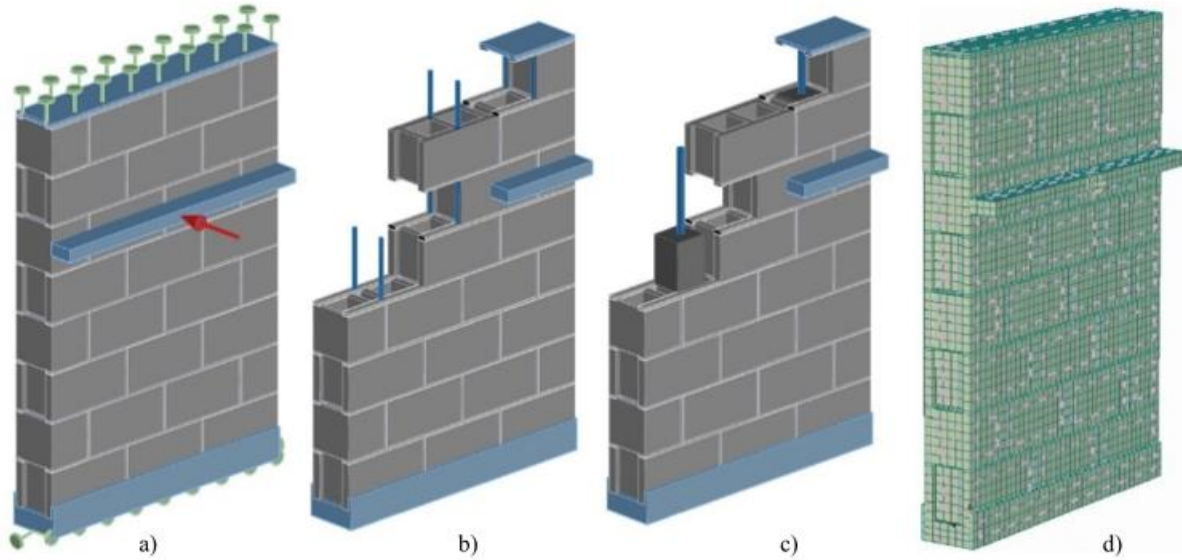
FE model of a reinforced masonry wall: a) Wall model support and load conditions; b) Hollow wall model with NSM reinforcement cutaway; c) Partially grouted conventionally reinforced wall model cutaway; and d) Meshed finite element model
